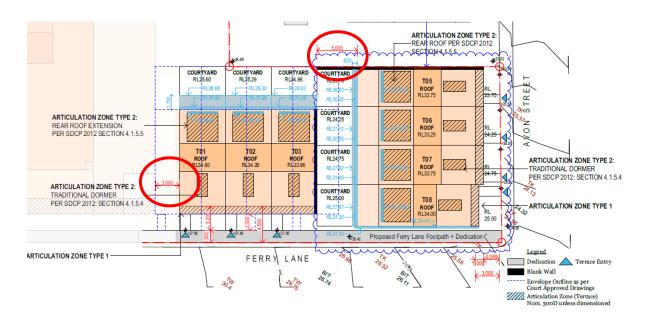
Proposed terrace building envelope, depicting 7 terraces
